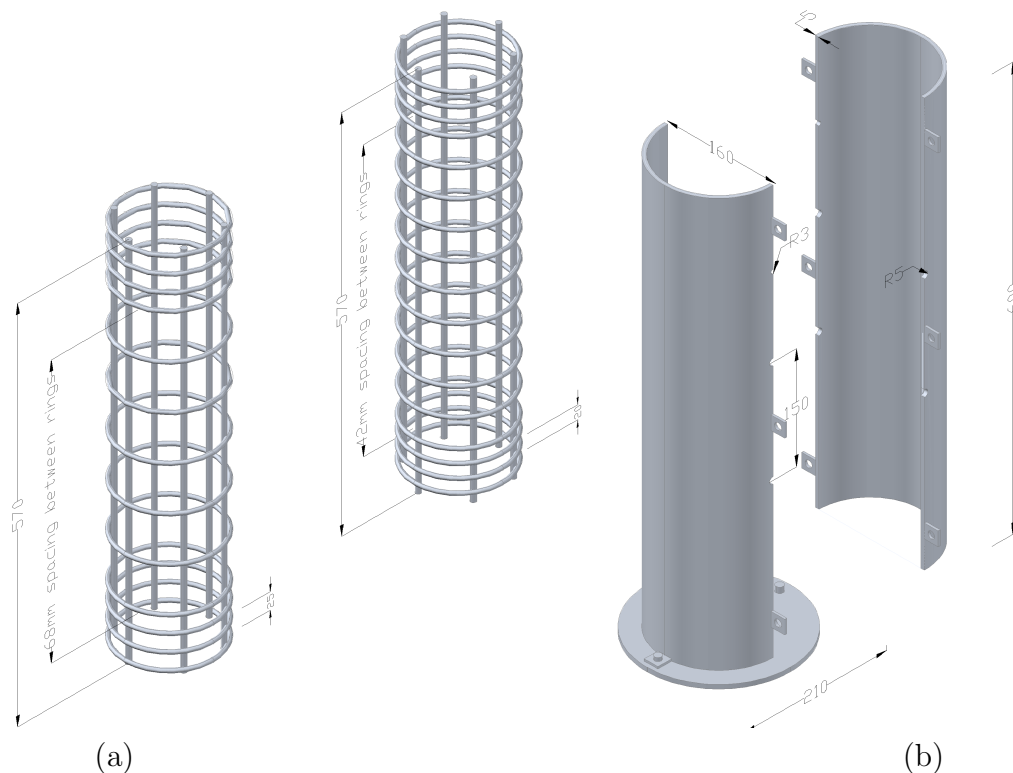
3D schematics of: (a) Confined concrete reinforcement (b) Split-type mould
